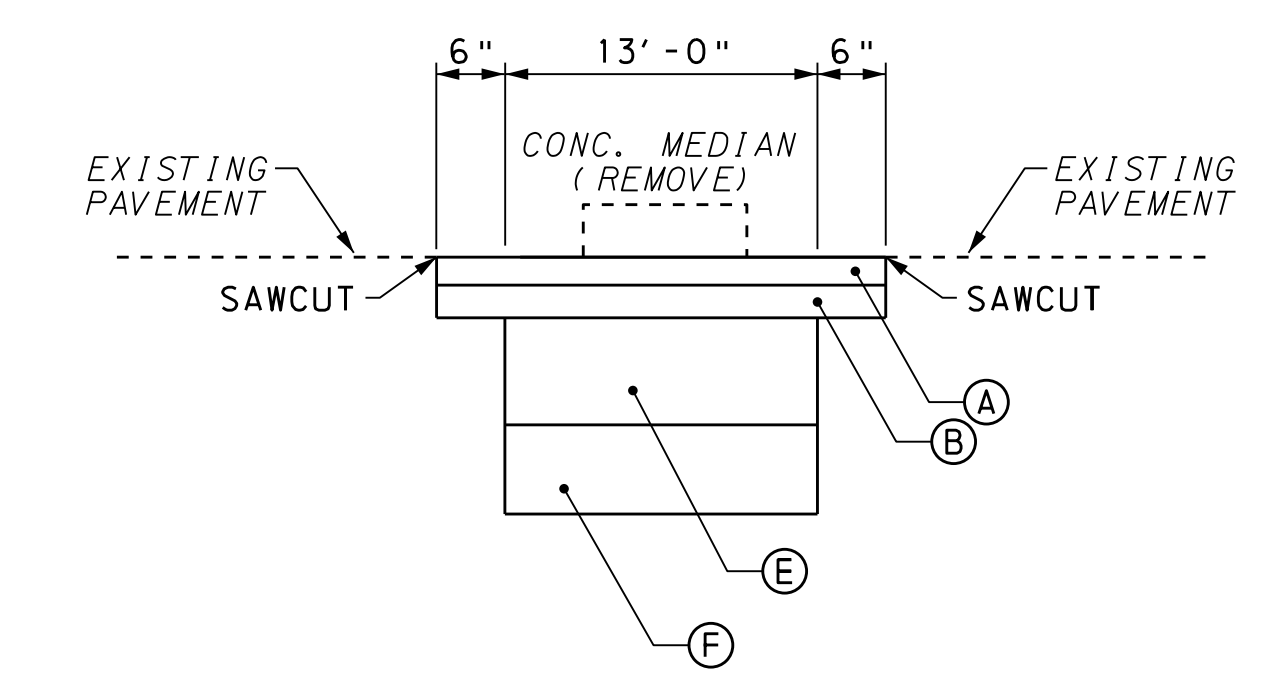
DETAIL TYPICAL SECTION CURB AND ROADWAY RESTORATION
